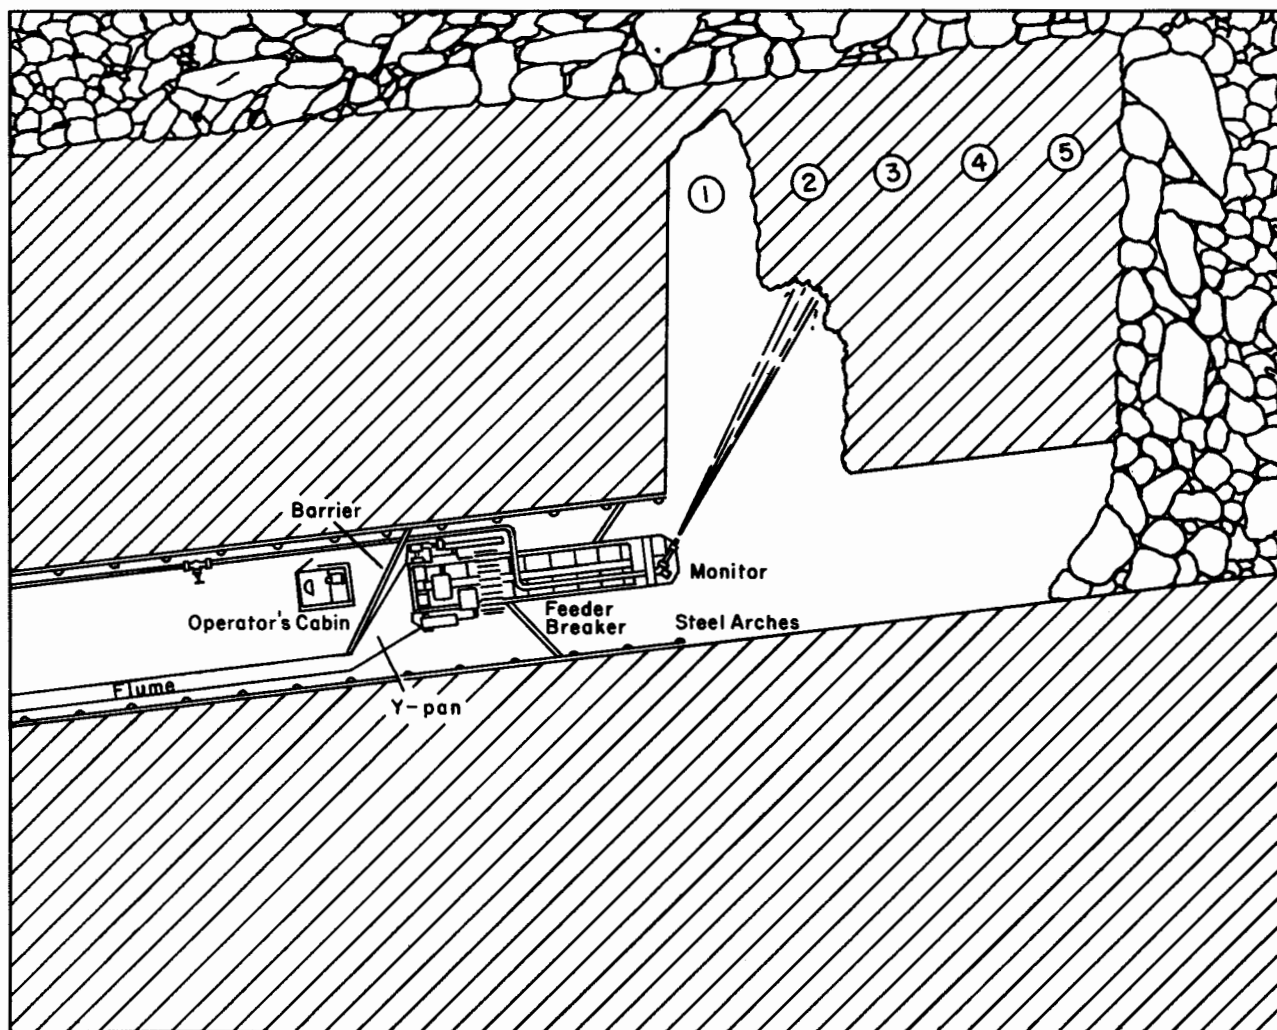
PLAN VIEW OF RETREATING FACE AREA, HYDRAULIC MINE
